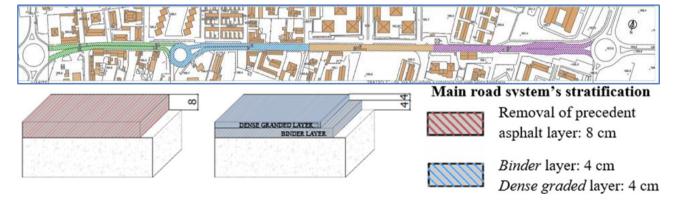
Detail of the design of low-noise pavement in Viale Libertà - Monza
